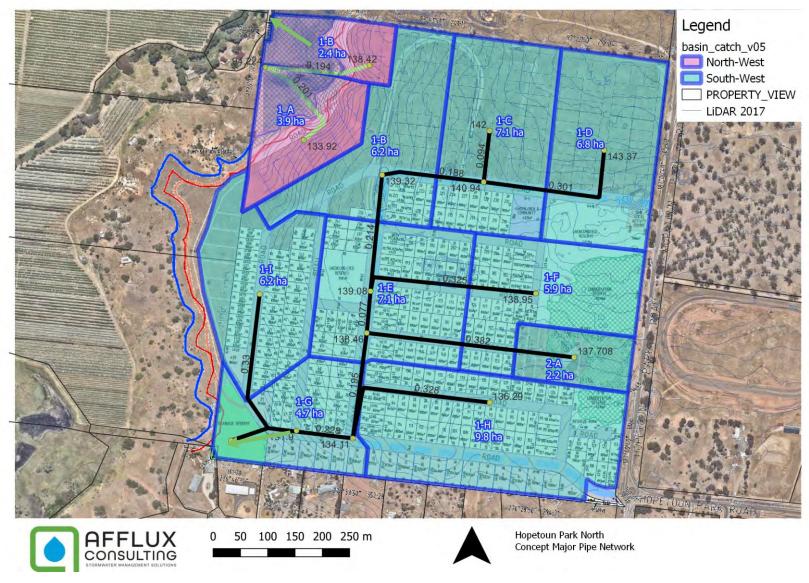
Proposed Development Catchment Area for West only (note subdivisional plan indicative only)
